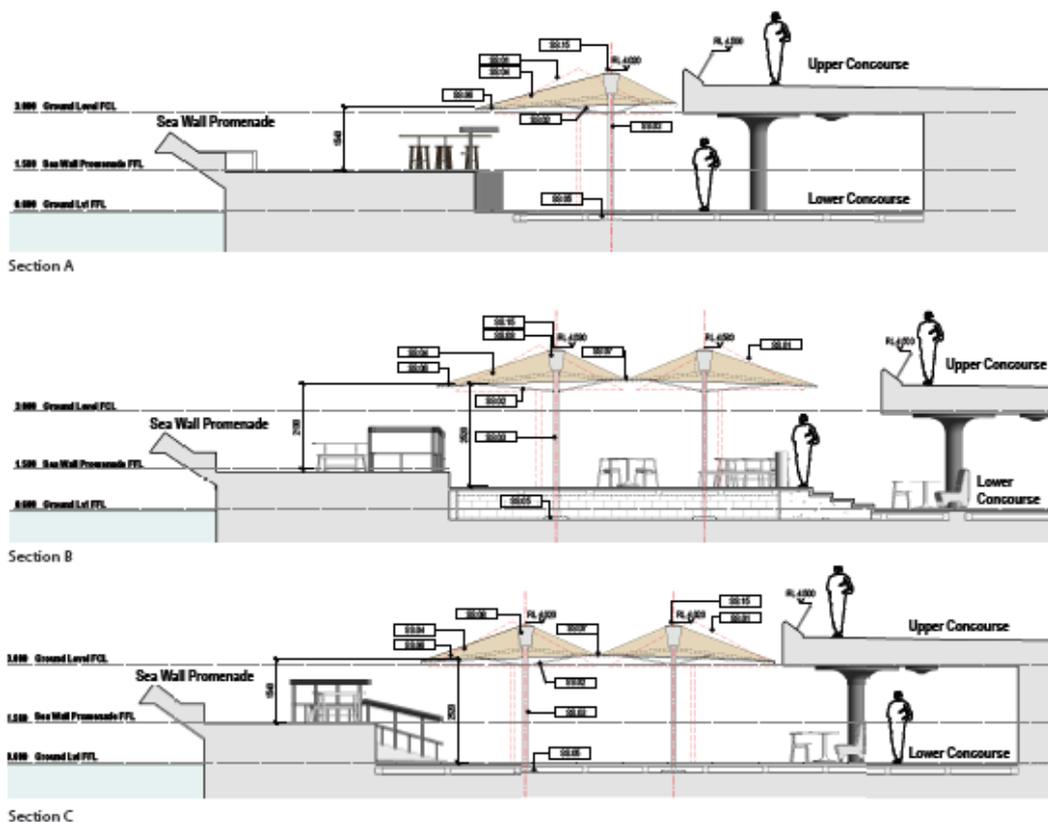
Section B of the proposed structures detailing the extent of the existing shade structures in red (Source: H&E Architecture)
